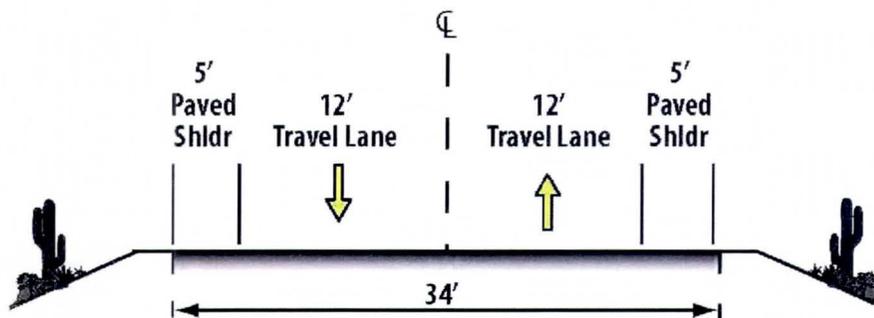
Interim Cross Section: McDowell Boulevard to Lost Dutchman Boulevard
